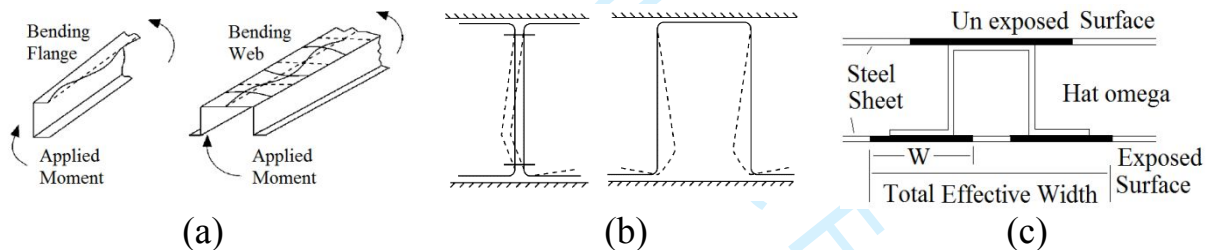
Local buckling of compression in flexural bending for beam element (a) stiffeners alone (b) stiffeners assembled with door sheet behaviors (c) door sheet total effective width
